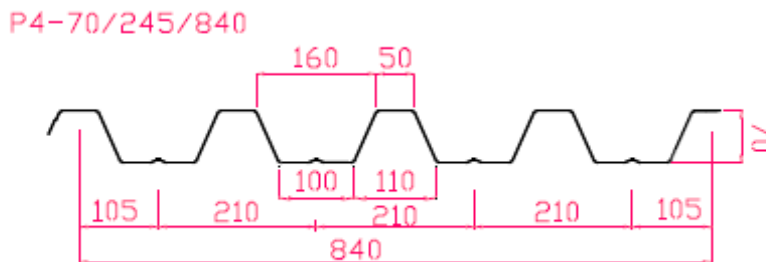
Shape of the cross-section of one tested arch (units in mm).
